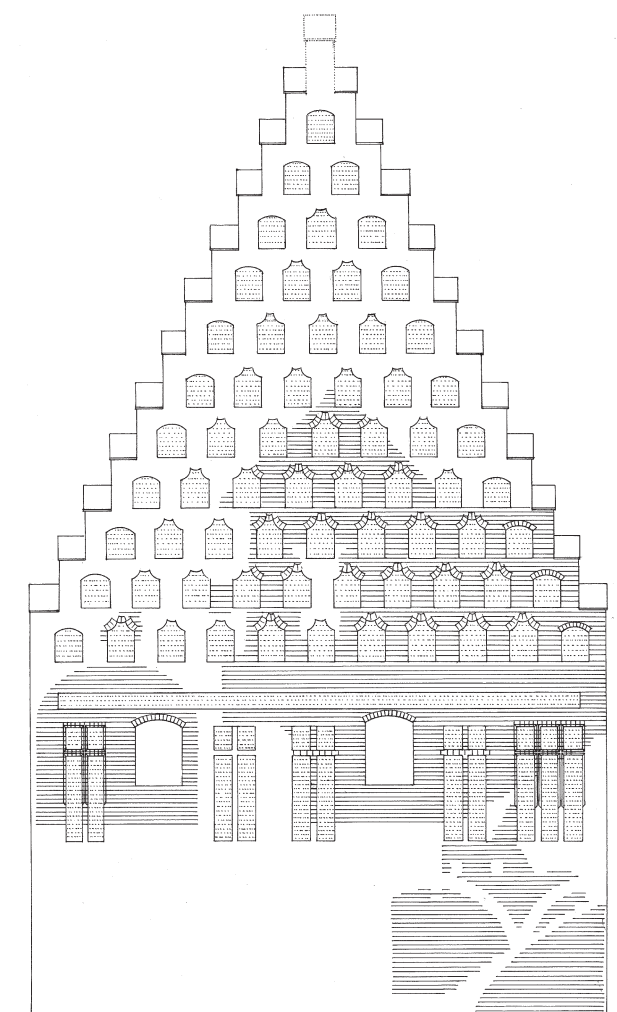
Reconstruction of the upper floor in the north elevation and gable of the Late-Gothic town hall (by A. Legendziewicz)
